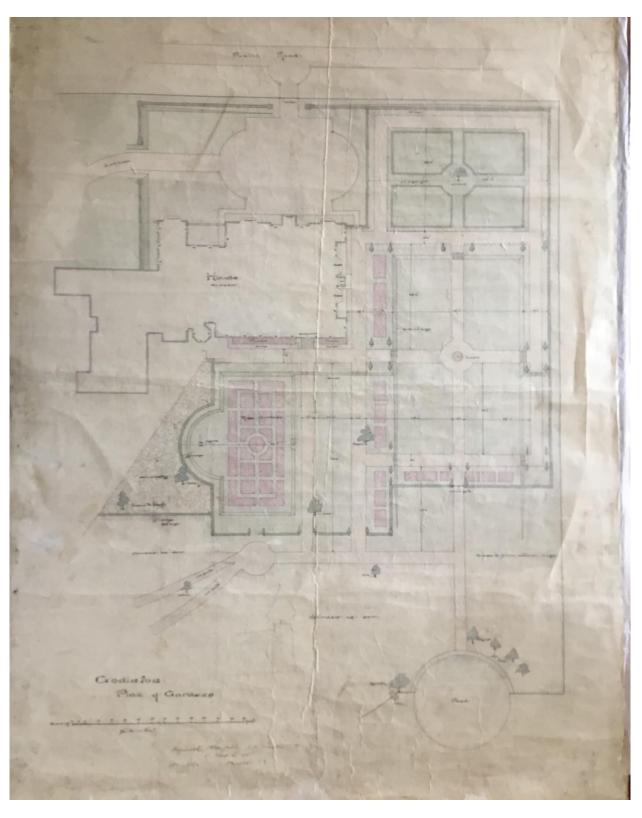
Blomfield's water damaged plan for the gardens at Godinton 1896. The Godinton House Preservation Trust.
